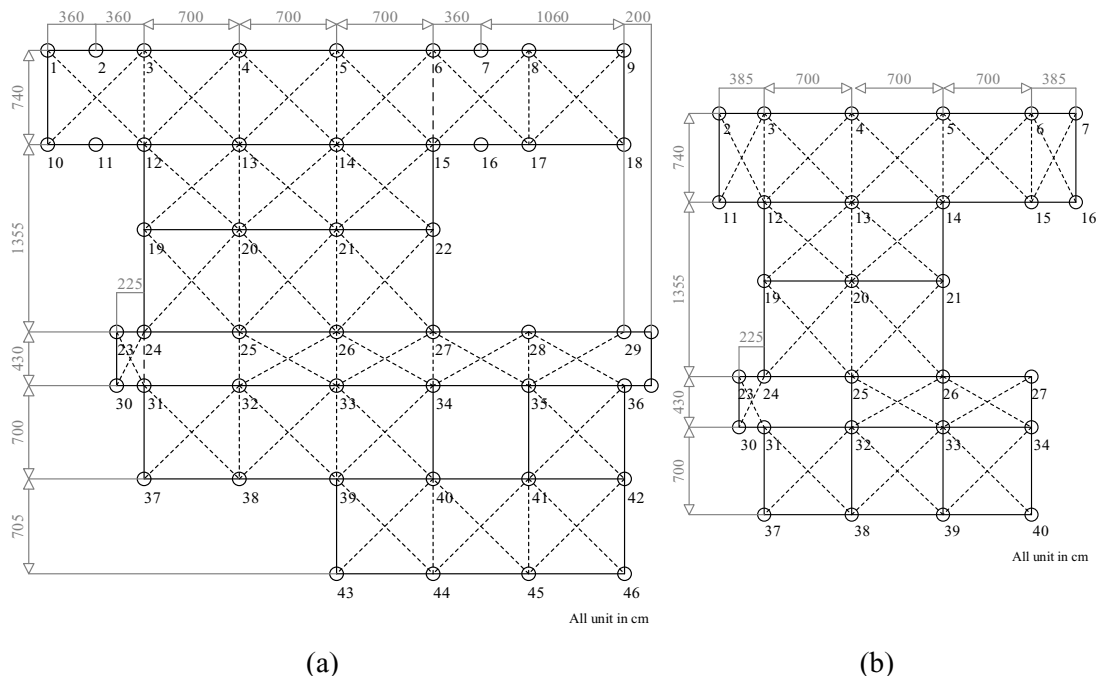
Plan view of the considered four-storey RC building: (1) 1st and 2nd floors; (2) 3rd and 4th floors
